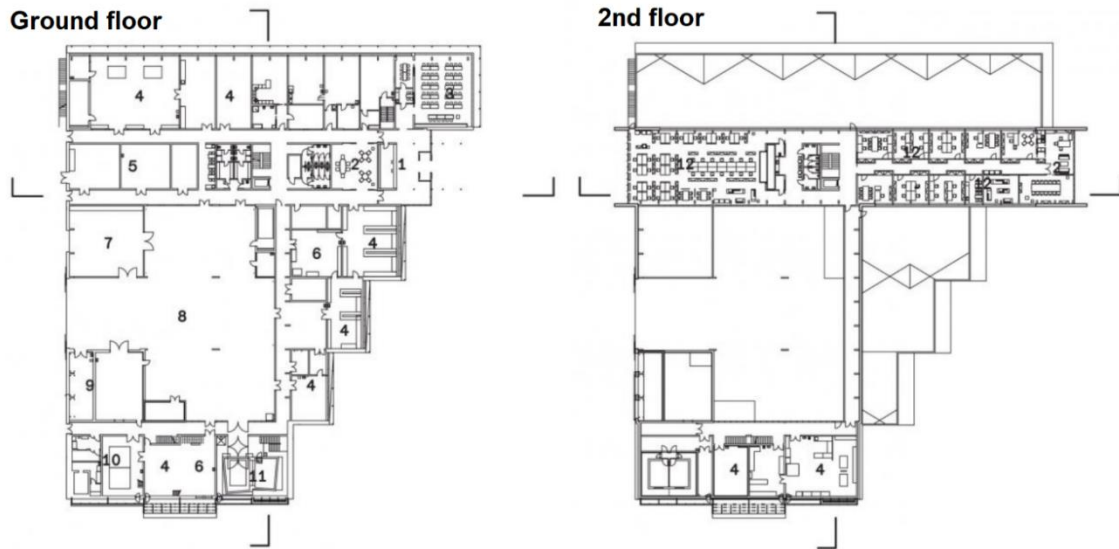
UCEEB DEMO BUILDING FLOOR PLANS
